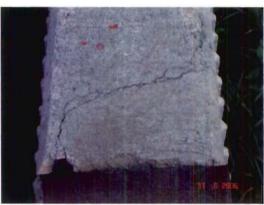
Hairline cracking at concrete to steel transition west of Burr south of RR.
